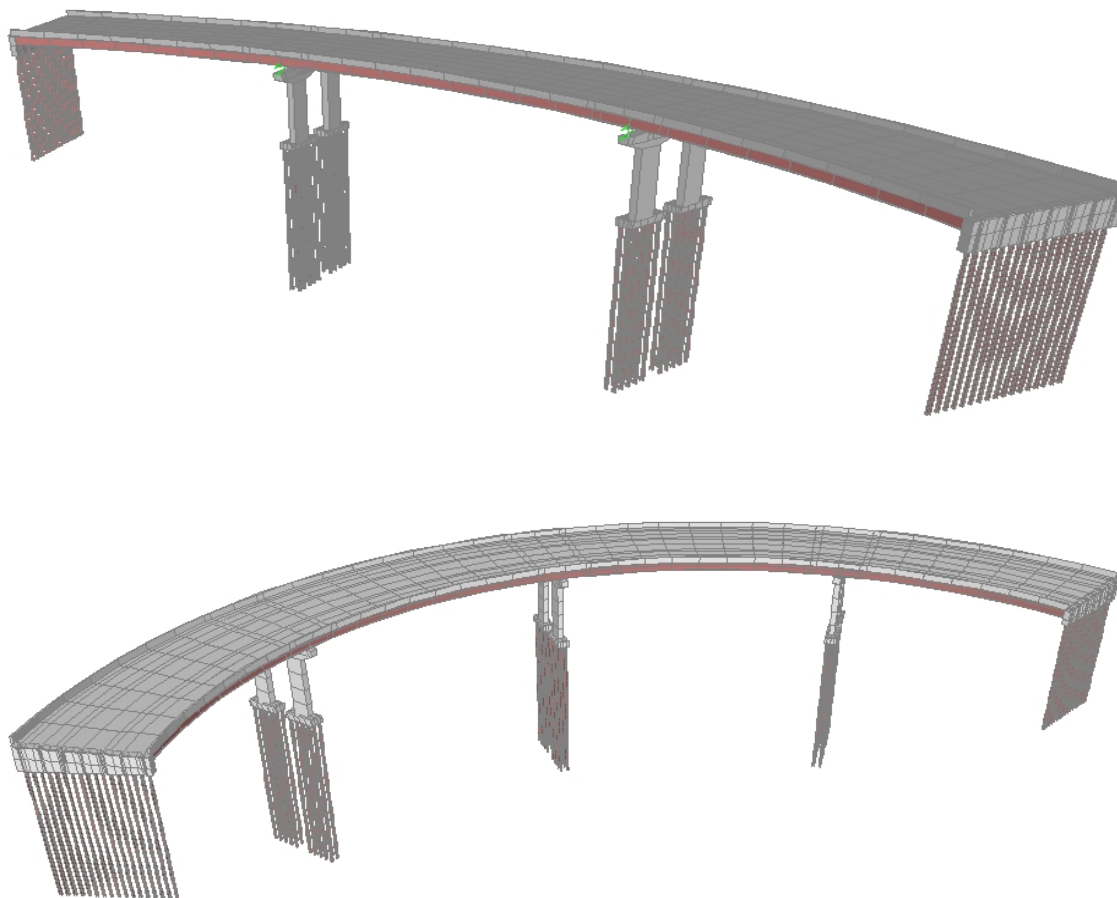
Typical Finite Element Models of the Studied Bridges
